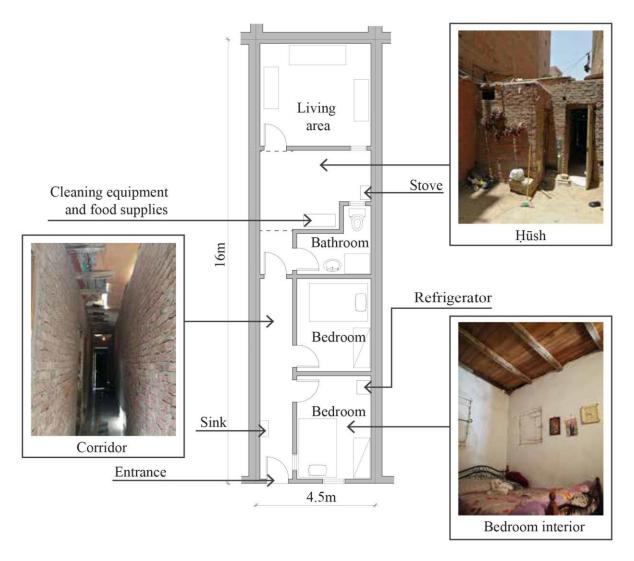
Suessi house: Furnished plan and pictures of different spaces in the house.
